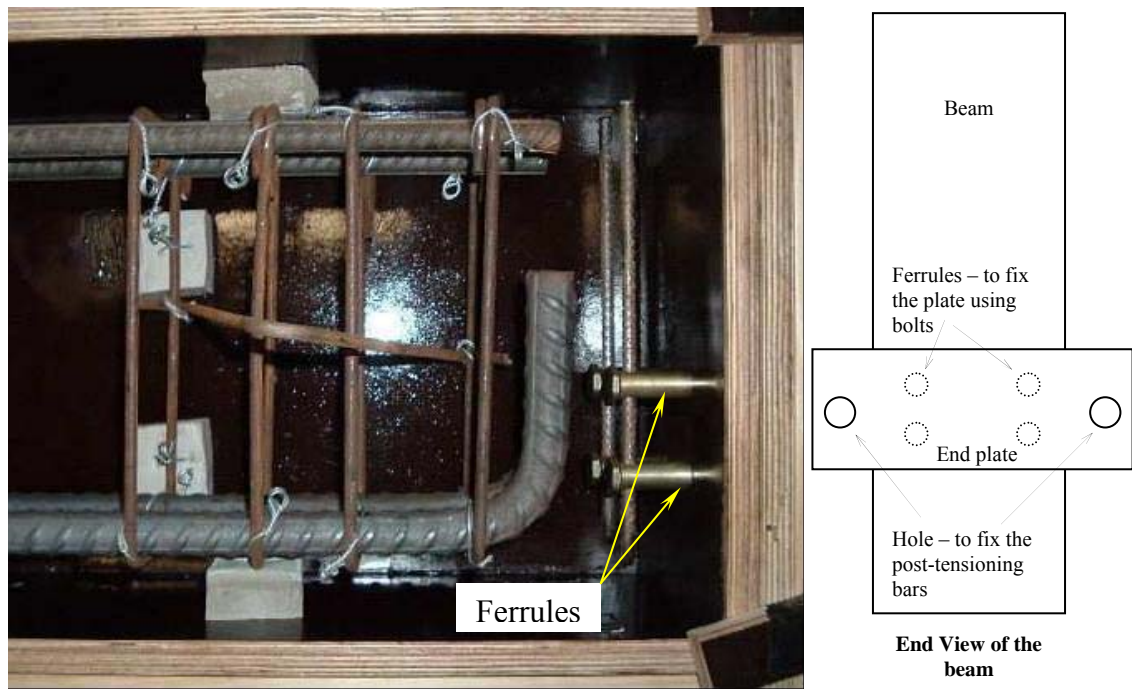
Detail of the reinforcement and cage arrangement that was fixed at each end of the specimens
